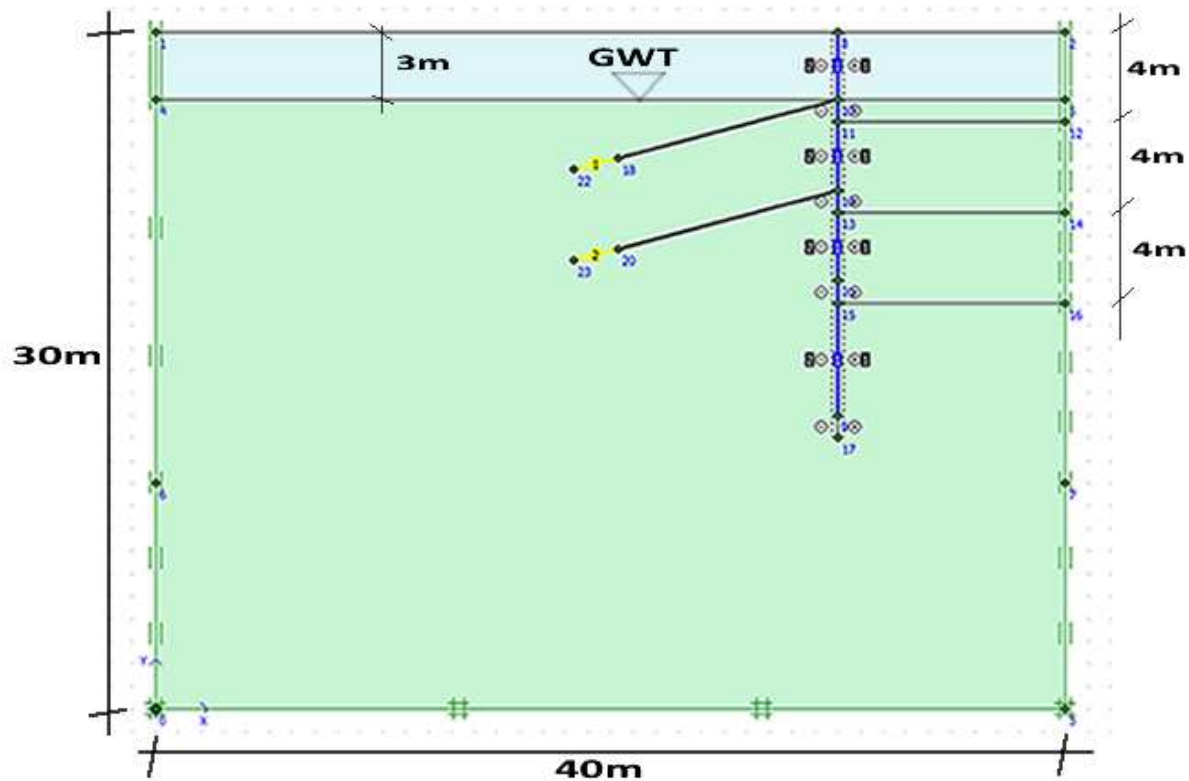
Typical sample model of the anchored diaphragm wall (Plaxis 2D)
